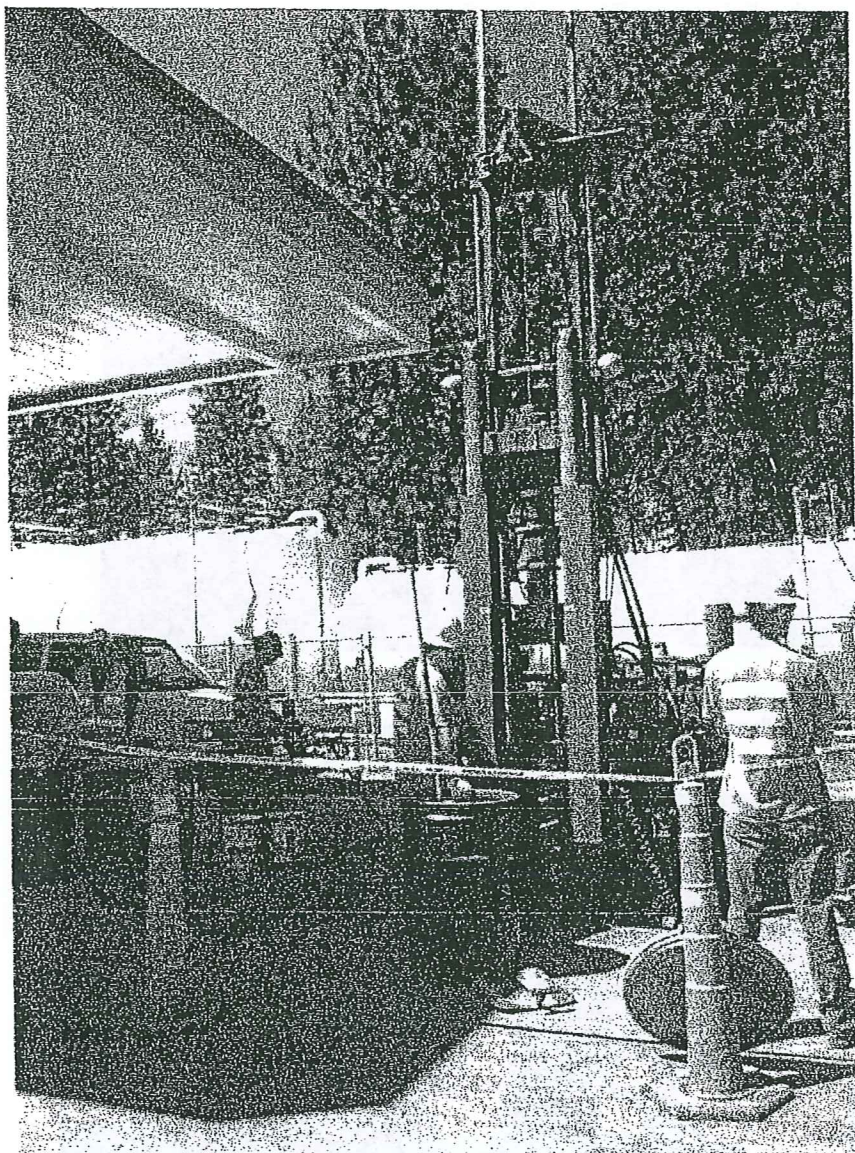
Staining in Soil, November 5, 2007 (Boring location B-5)
